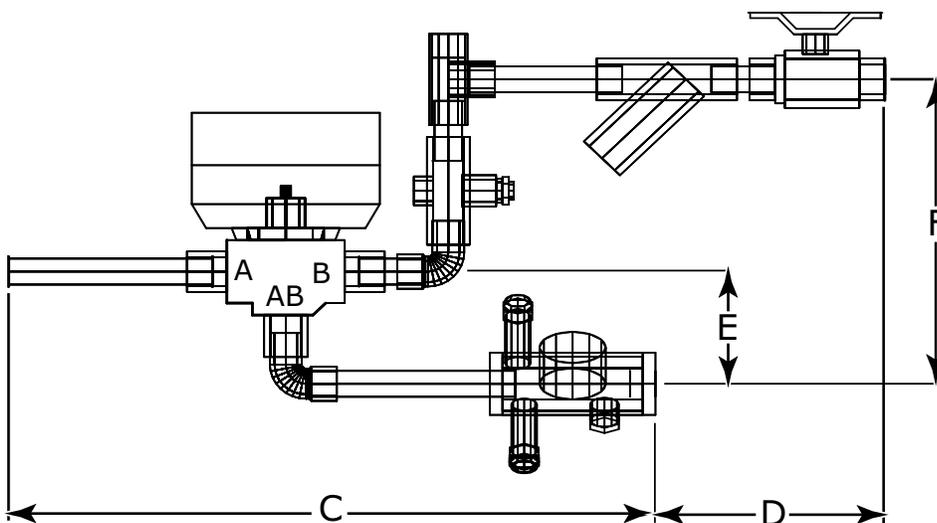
Three-way 1/2-in. and 1-in. valve deluxe piping package
